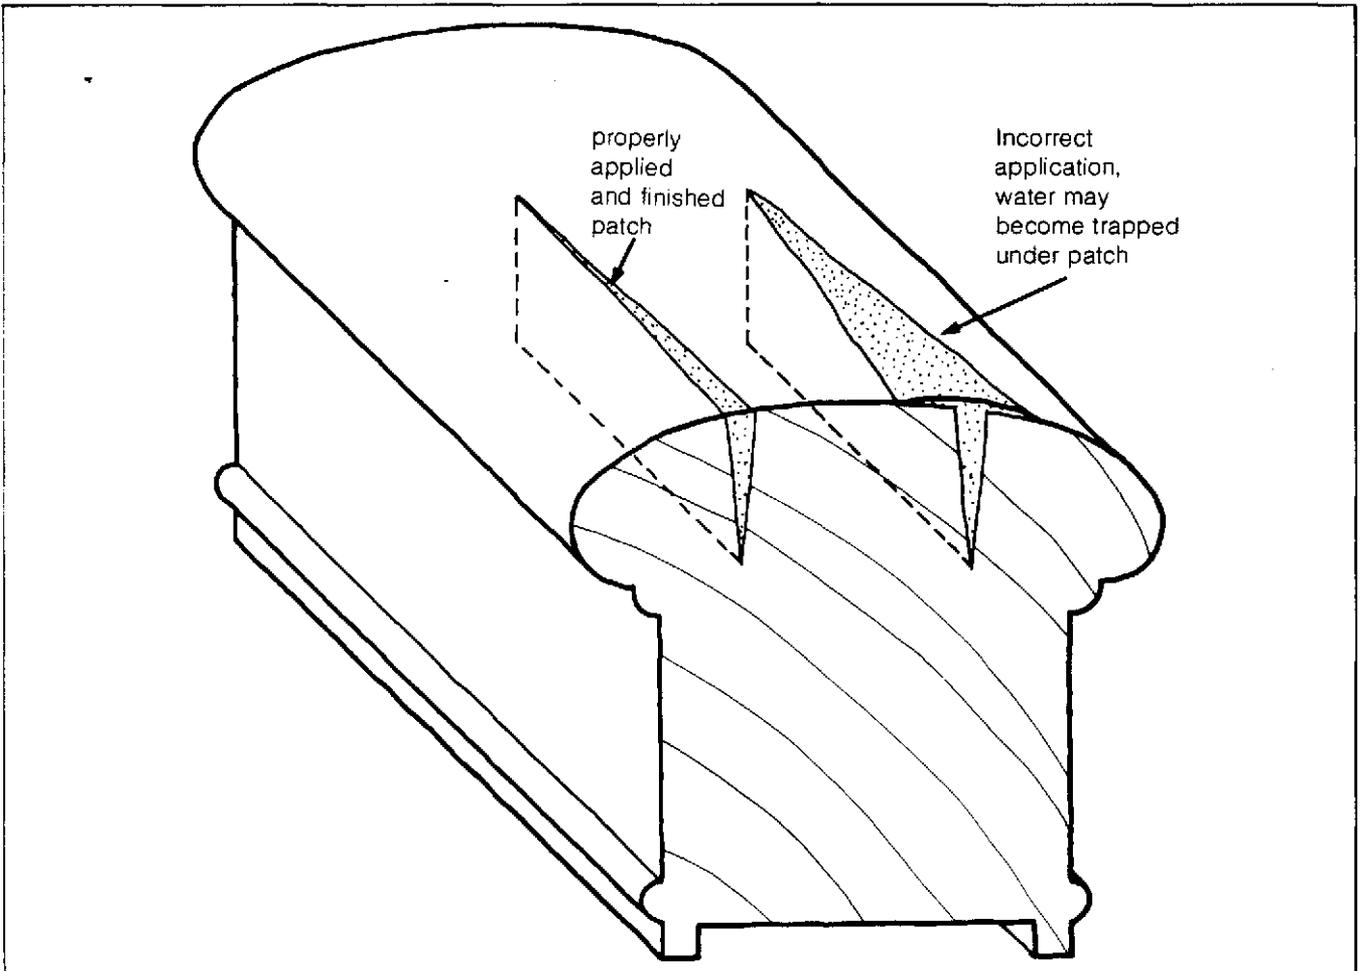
Longfellow House, Porch Handrail. Semi-rigid patching compound No. 1 was used to fill the cracks. A putty knife was employed to force the material into the openings.
